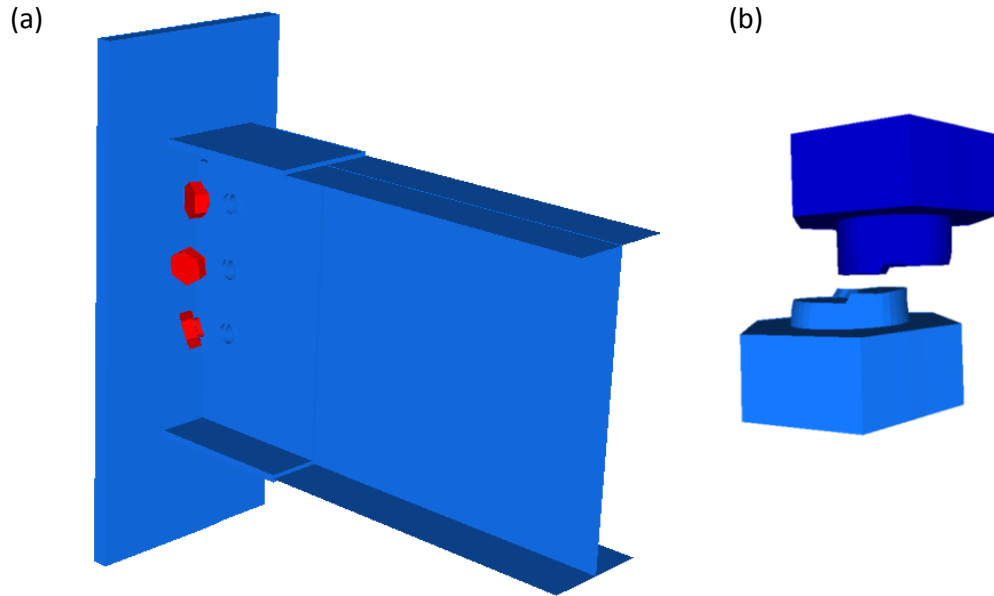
Bolt shear failure mode at 600 °C: (a) Perspective view showing the bolt heads (in red) separating from the connection after shear failure, and (b) top view of a sheared bolt.
